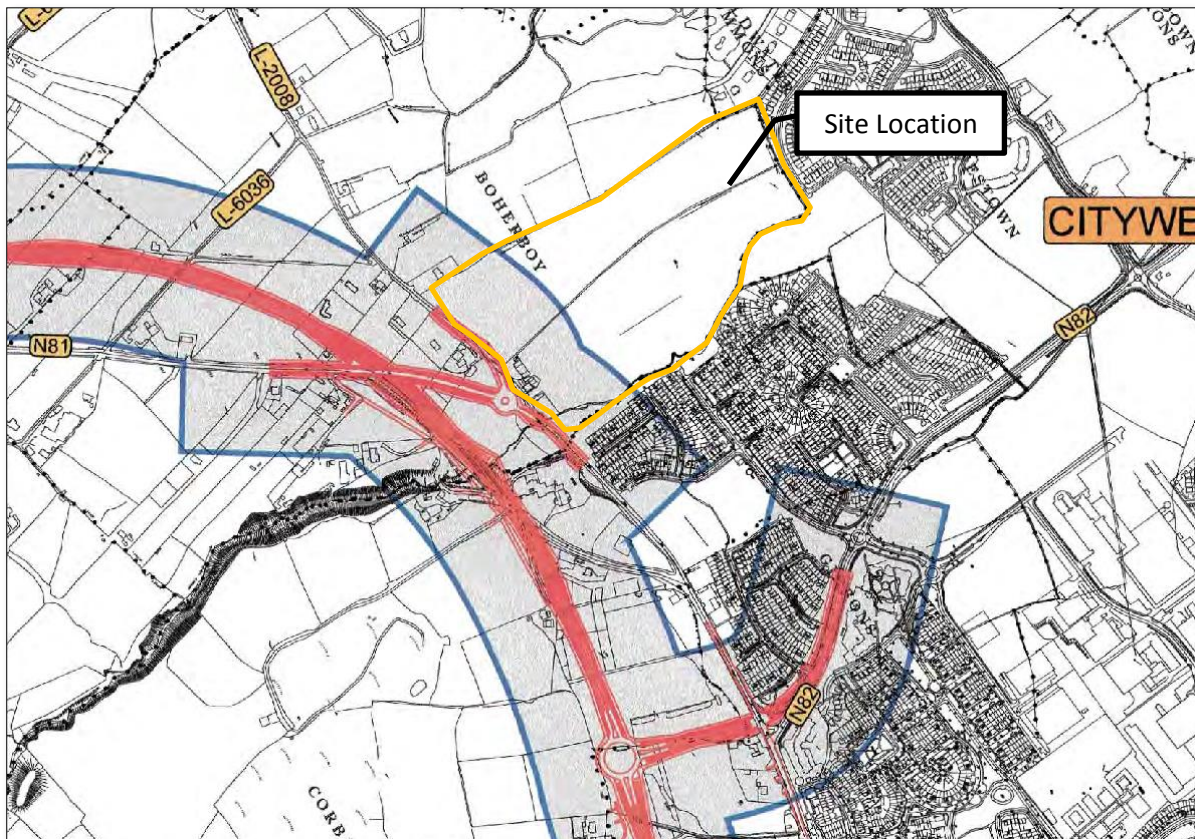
N81 Hollywood Cross to Tallaght Road Improvement Scheme Extract
